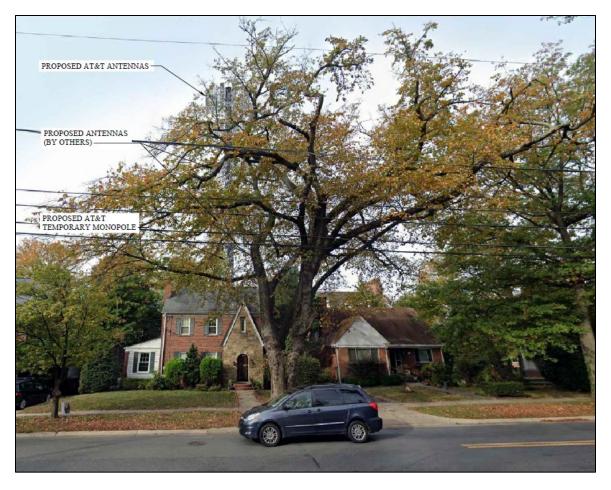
Eastern Elevation of Proposed Temporary Pole (From Second Avenue and Stratton Road)
